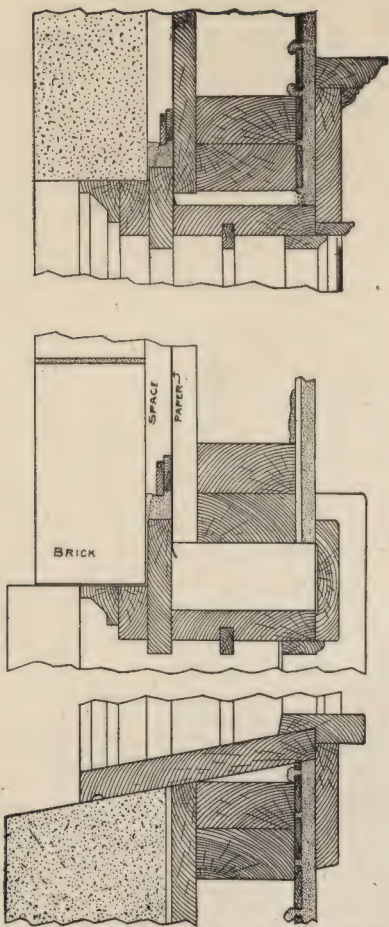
Wall Section Showing Air-Spaces and Framing.
